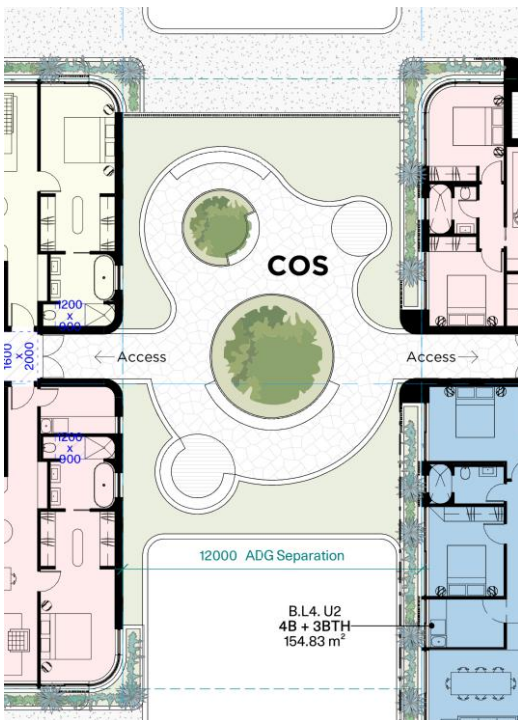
Communal open space on level 4 of Buildings A/B (Source: PMDL)
